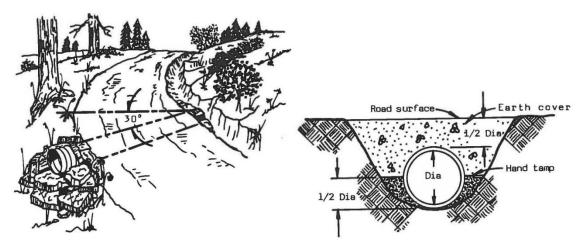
Culvert Detail (Modified from Idaho Department of Lands, 1992.)
